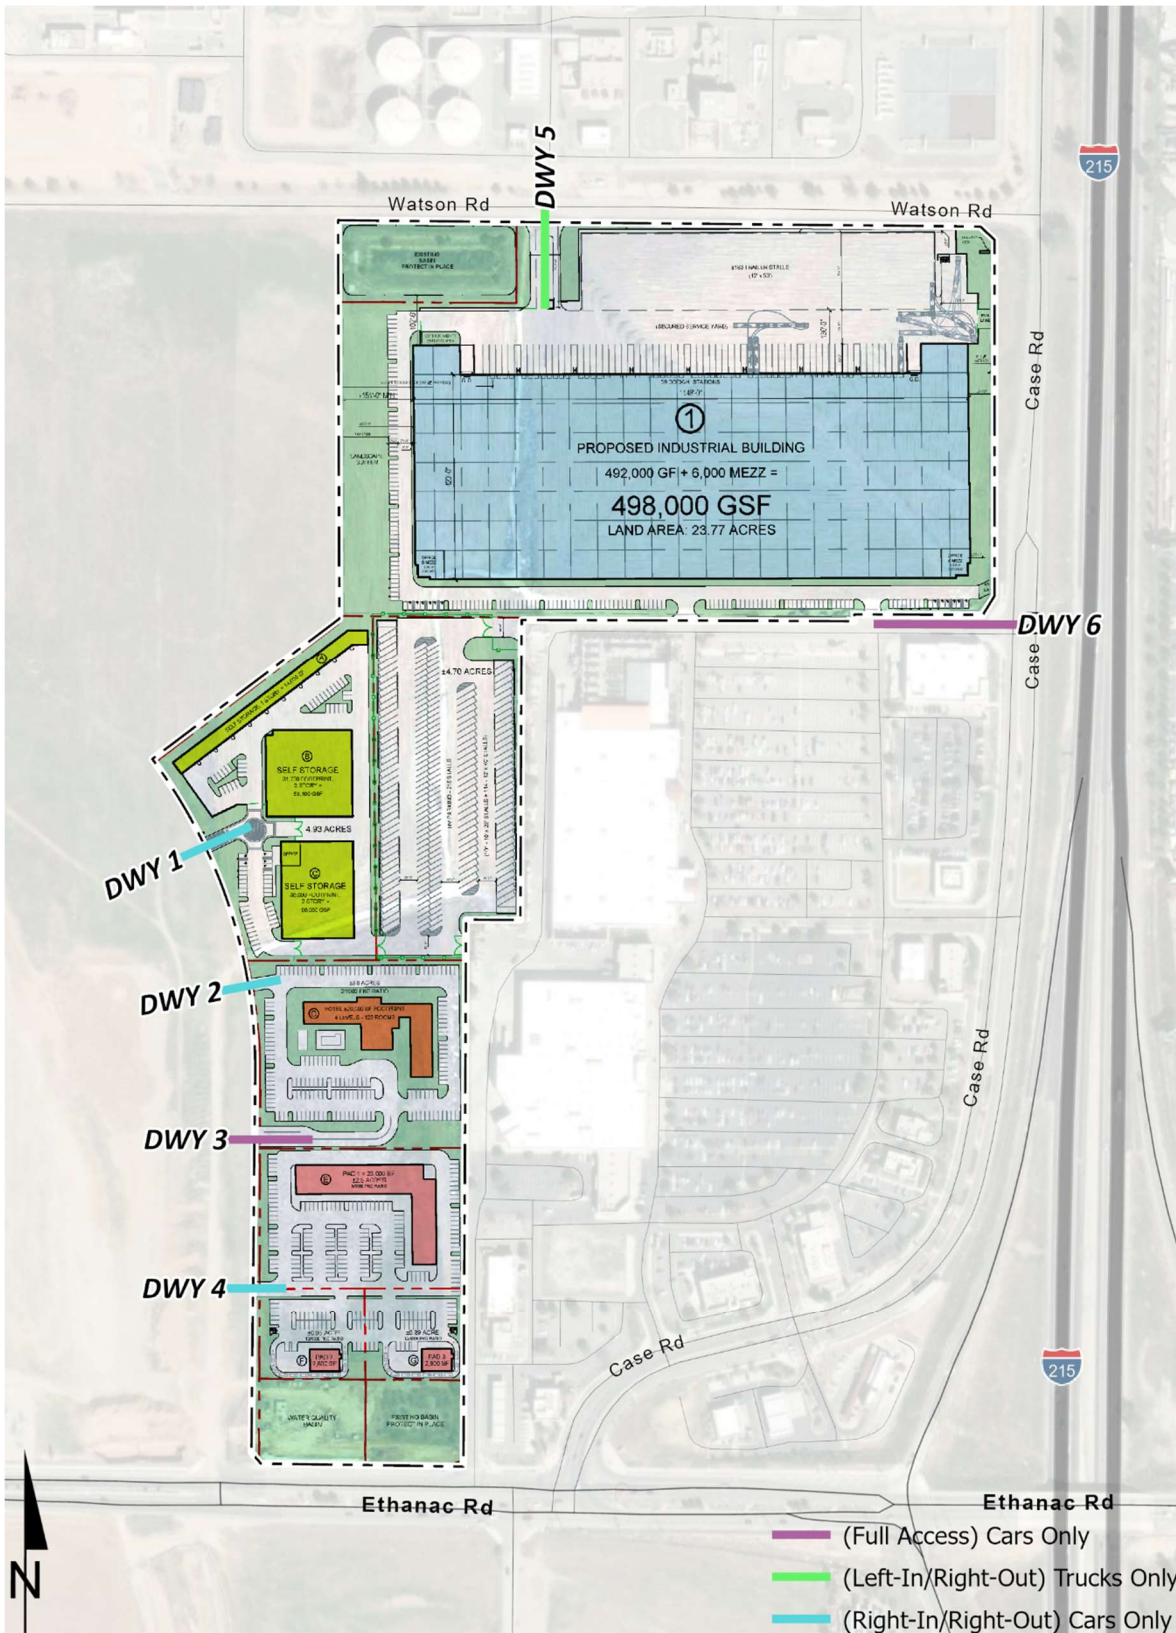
PRELIMINARY SITE PLAN
